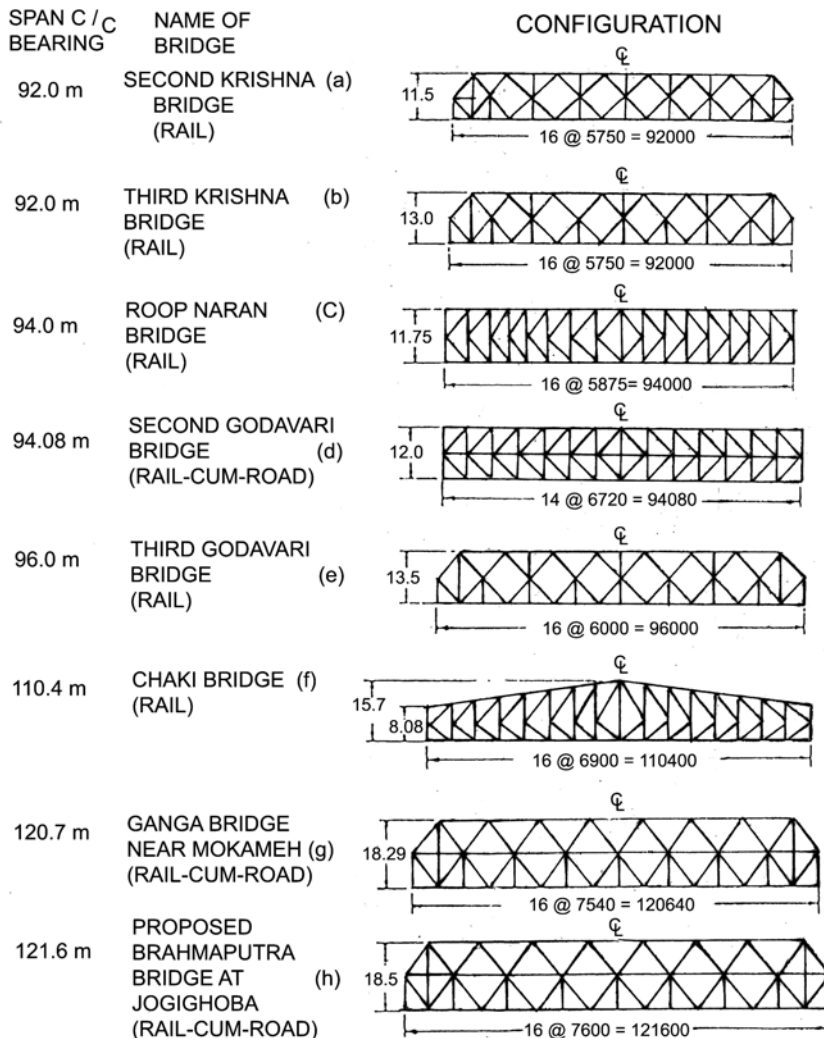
SPECIAL THROUGH GIRDERS OF LONGER SPAN
